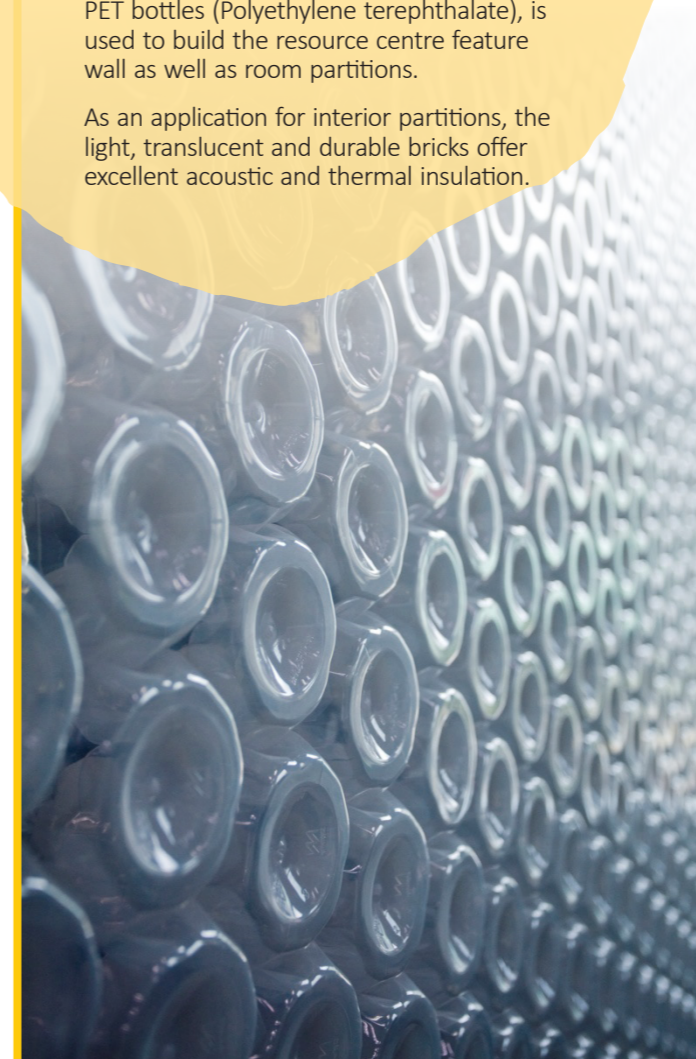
POLLI-BRICKS Wall (Source: Hong Kong Green Building Council)
